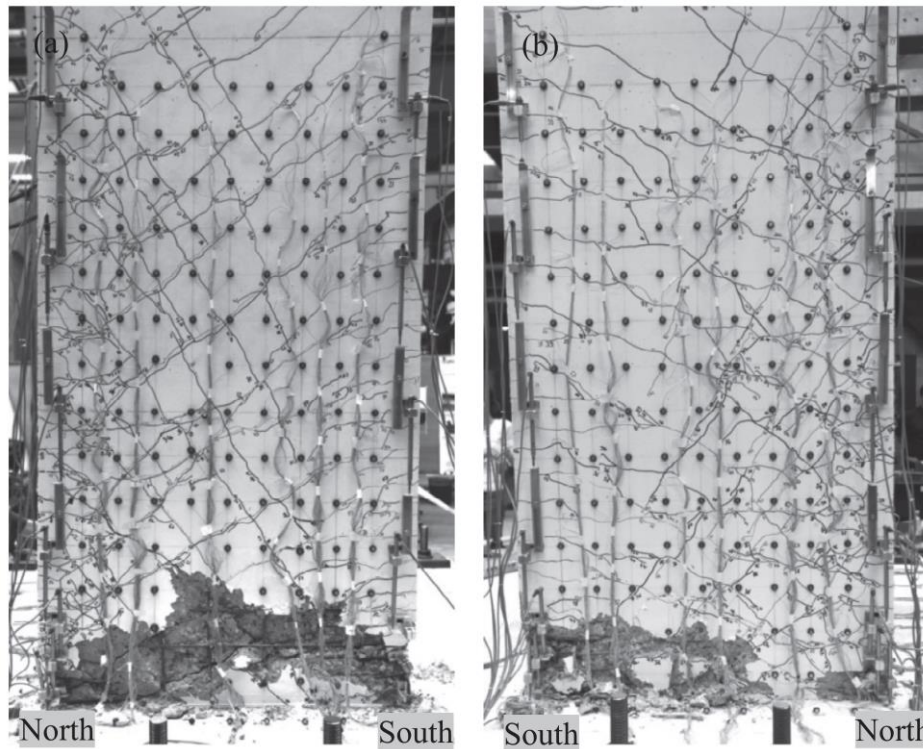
Influence of the vertical reinforcement layout on the damage to the unconfined concrete of the wall flanges in specimen TUC (a) concentrated reinforcement layout (West flange) and (b) distributed reinforcement layout (East flange) (Constantin and Beyer 2016)
